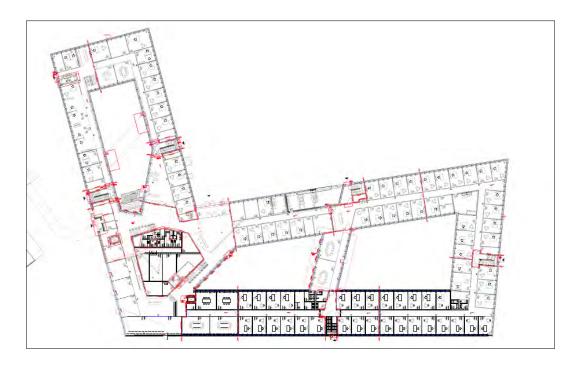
Current floor plan of the New Office Building, kadawittfeld architecture (Aachen 2016)
